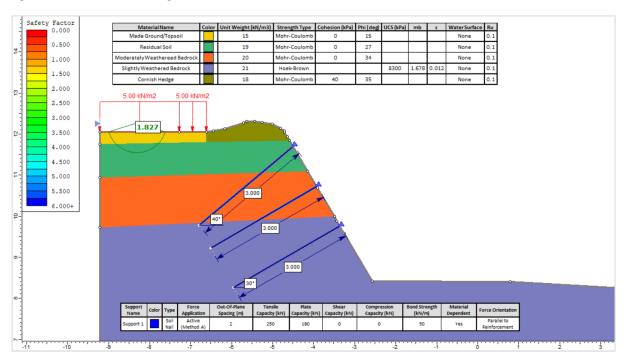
Section 1 – Facing Installation - BS8006 Set1
